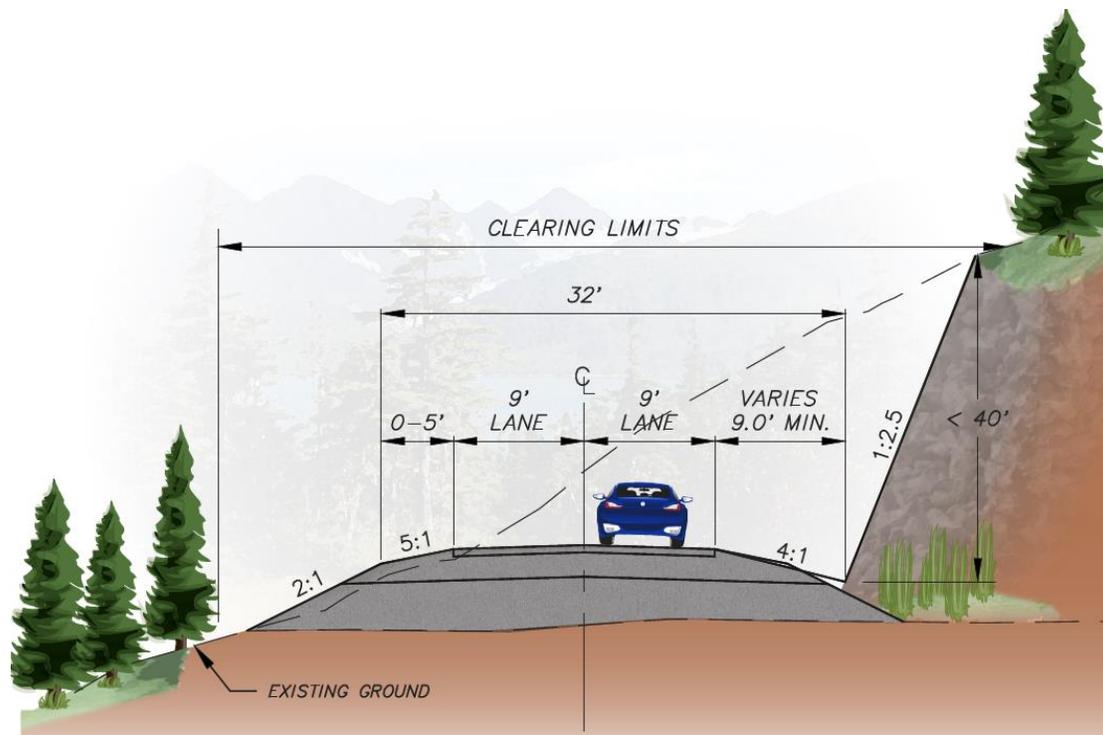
Typical Shotgun Cove Road Extension Project Spur Access Road Cross Section
